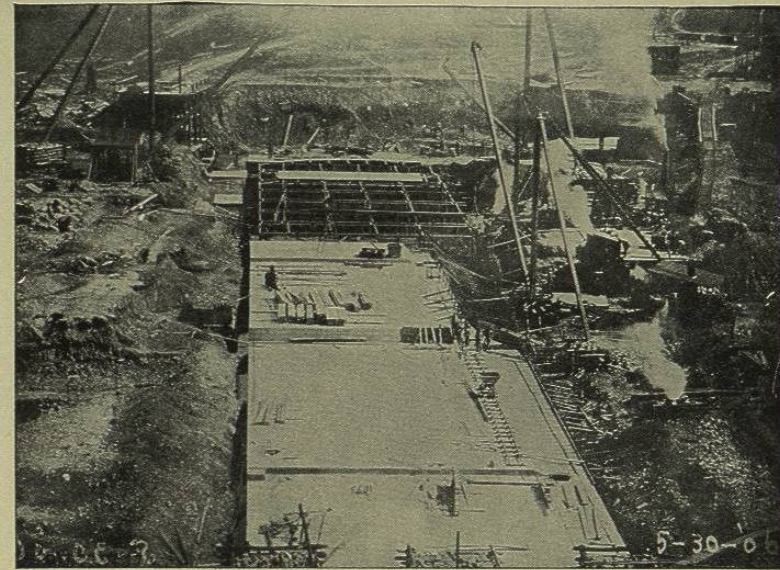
FLOOR CONSTRUCTION, JUNIATA DAM.
